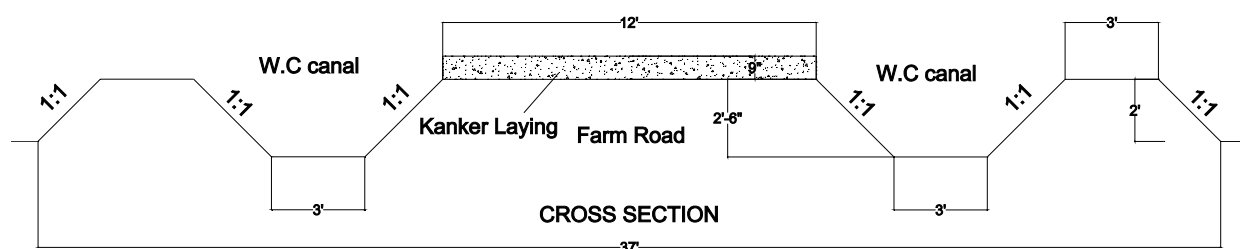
Cross Section of Lateral Farm Road and Irrigation Canal
